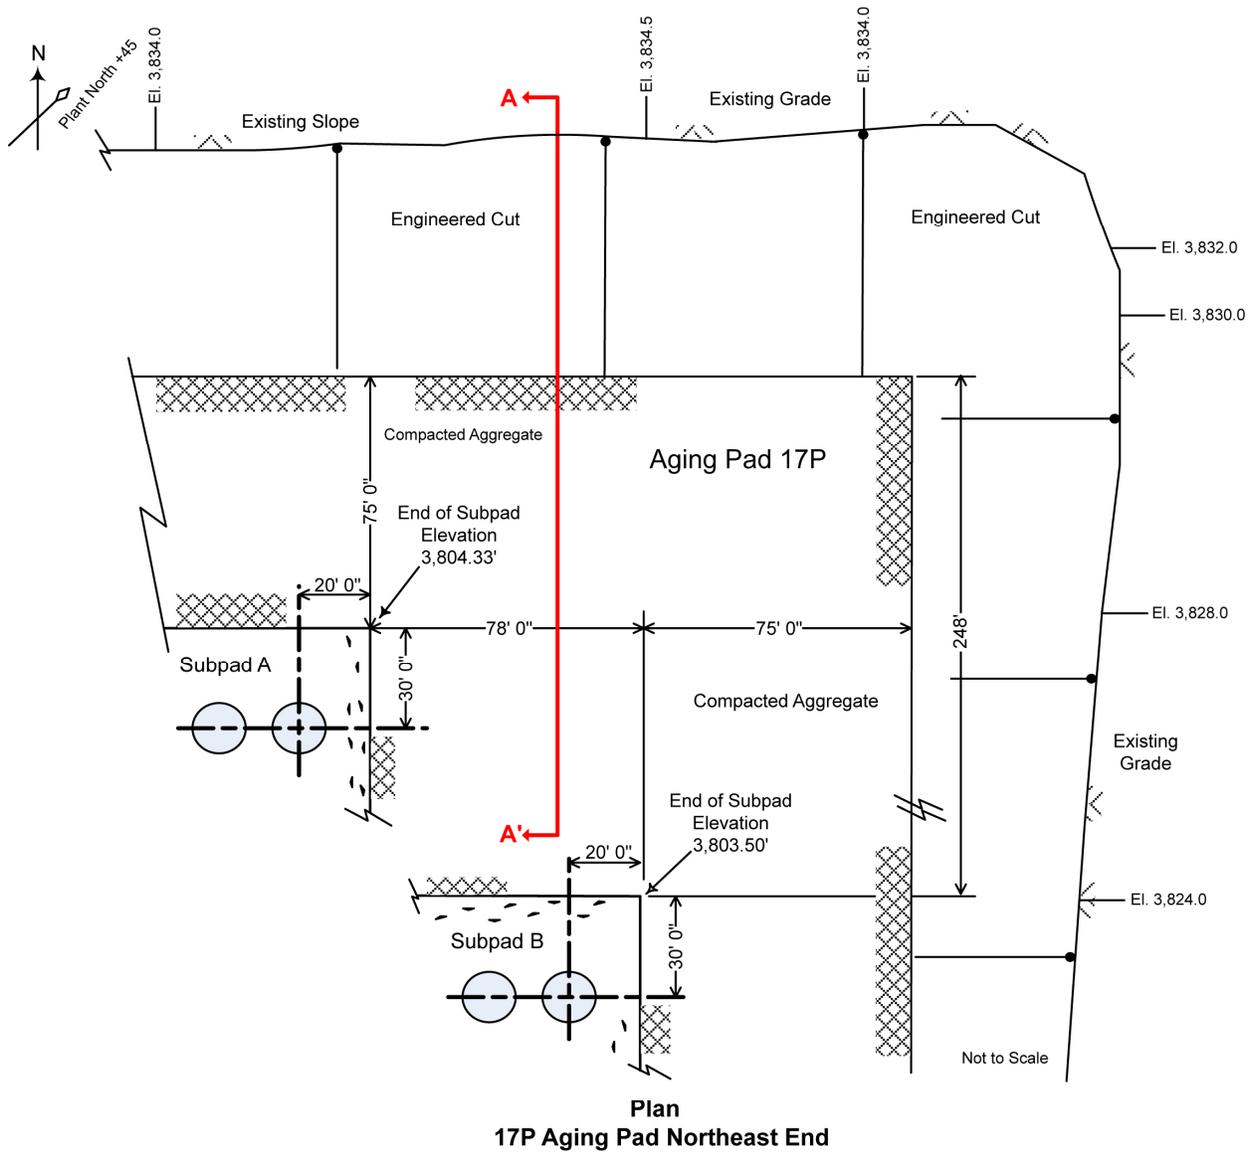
Aging Pad 17P Partial Plan and Section Showing Cut Slopes, Northeast Corner
